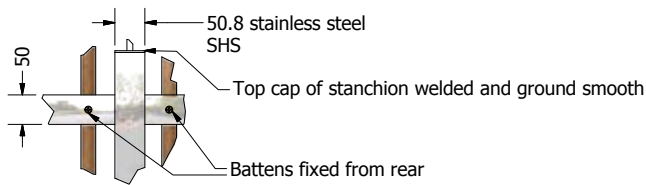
Back elevation. Stainless steel handrail stanchions and cross-bars contrast agreeably with the timber infill. Spacing of stanchions and battens is managed so that stanchions occur at the mid-point between battens.
